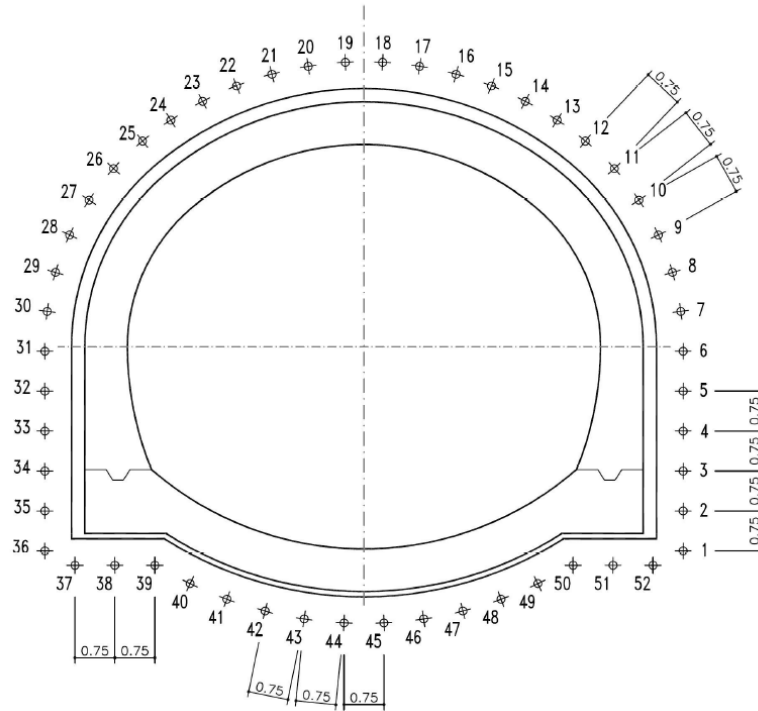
Geometry of freeze pipes for a typical platform tunnel of Naples underground metro (Colombo, 2010)
